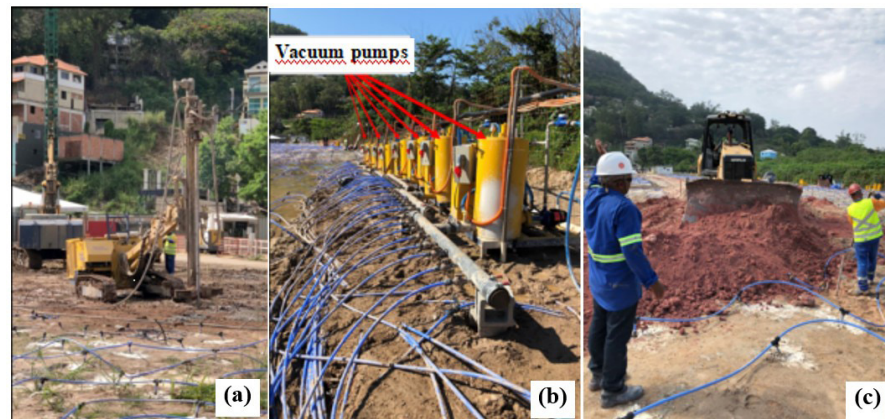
Drain-to-drain vacuum consolidation: (a) vertical drains and installation of collectors (b) pumps and collector tubes (c) detail of embankment construction over collectors and connections (Freitas, 2021).
